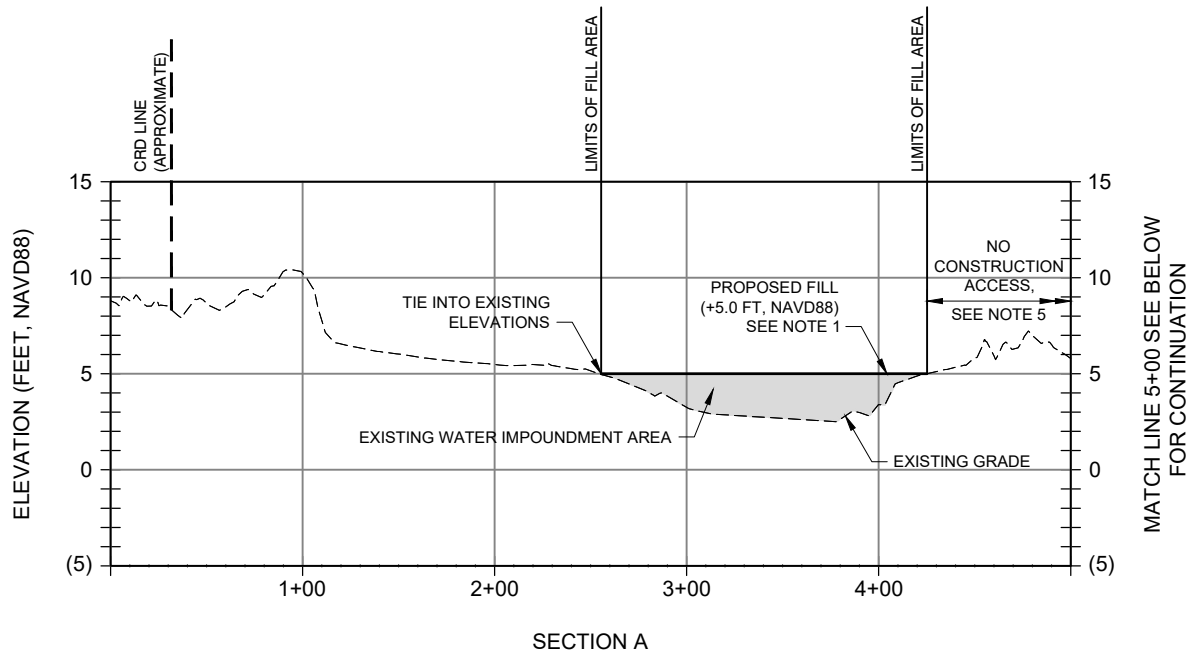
ALTERNATIVE 2 SCHEMATIC DESIGN PLAN
